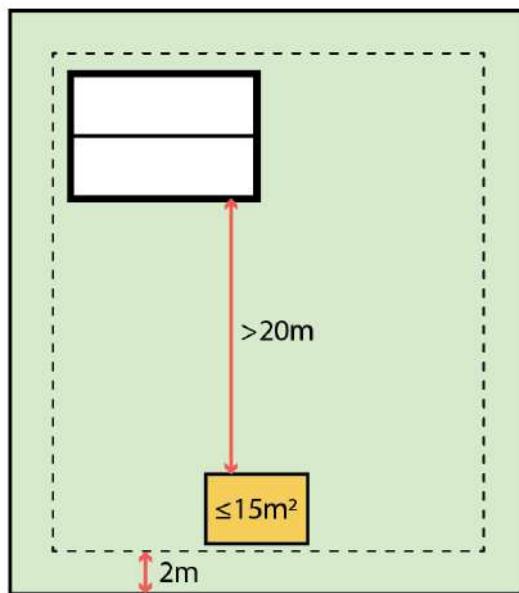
Proposed maximum area of a garden building or pergola (situated more than 20 metres from any wall of the dwelling)
